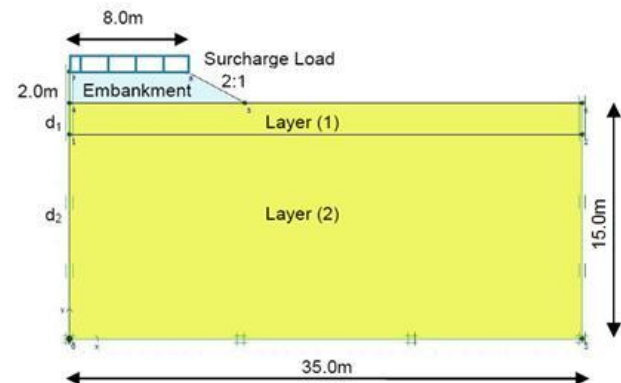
Ground profile and road embankment dimensions used in finite element analyses
